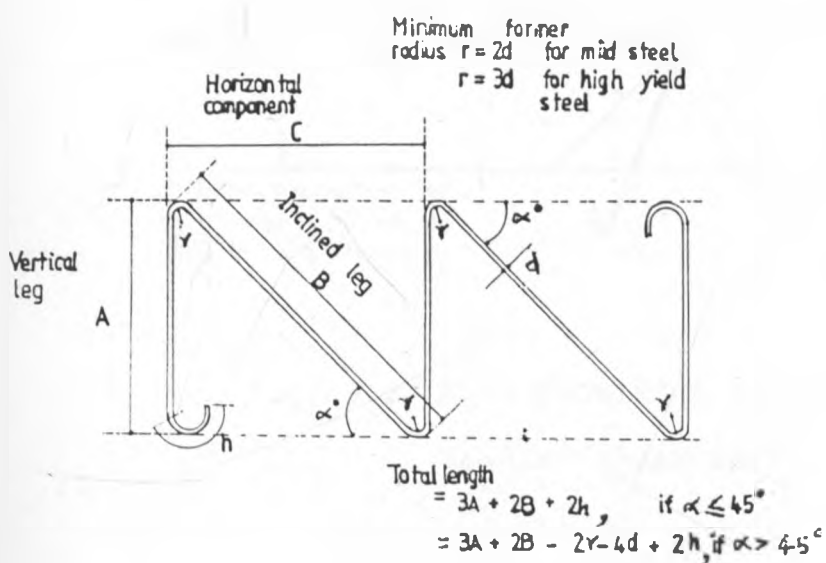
TYPICAL BENDING DIMENSIONS
